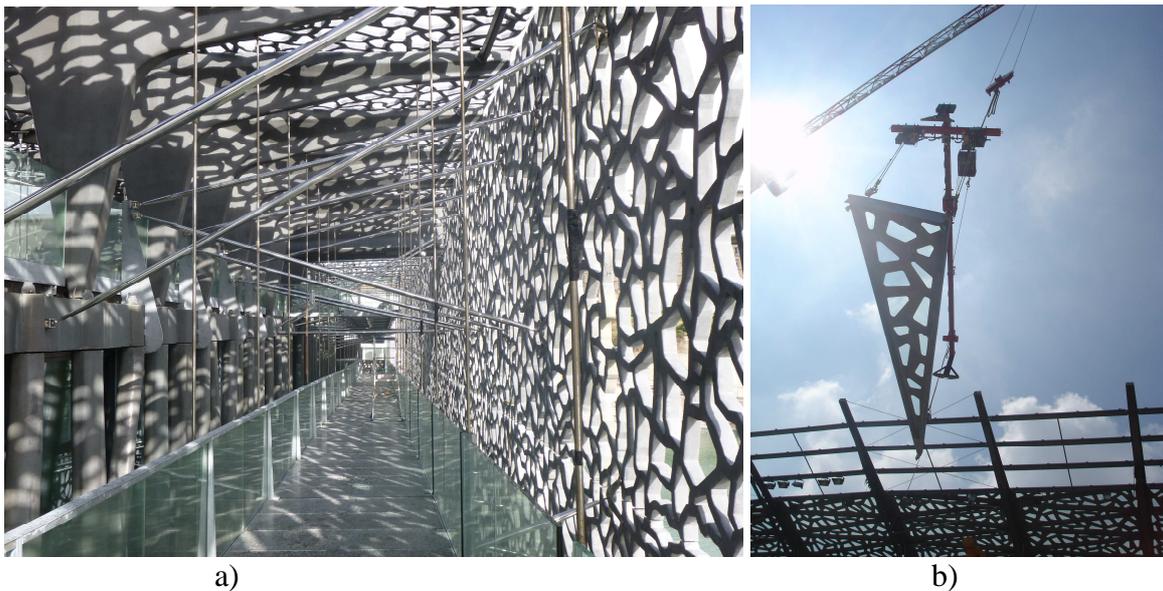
UHPFRC net panels a) Galleries of MuCEM b) Jean Bouin Stadium roofing
